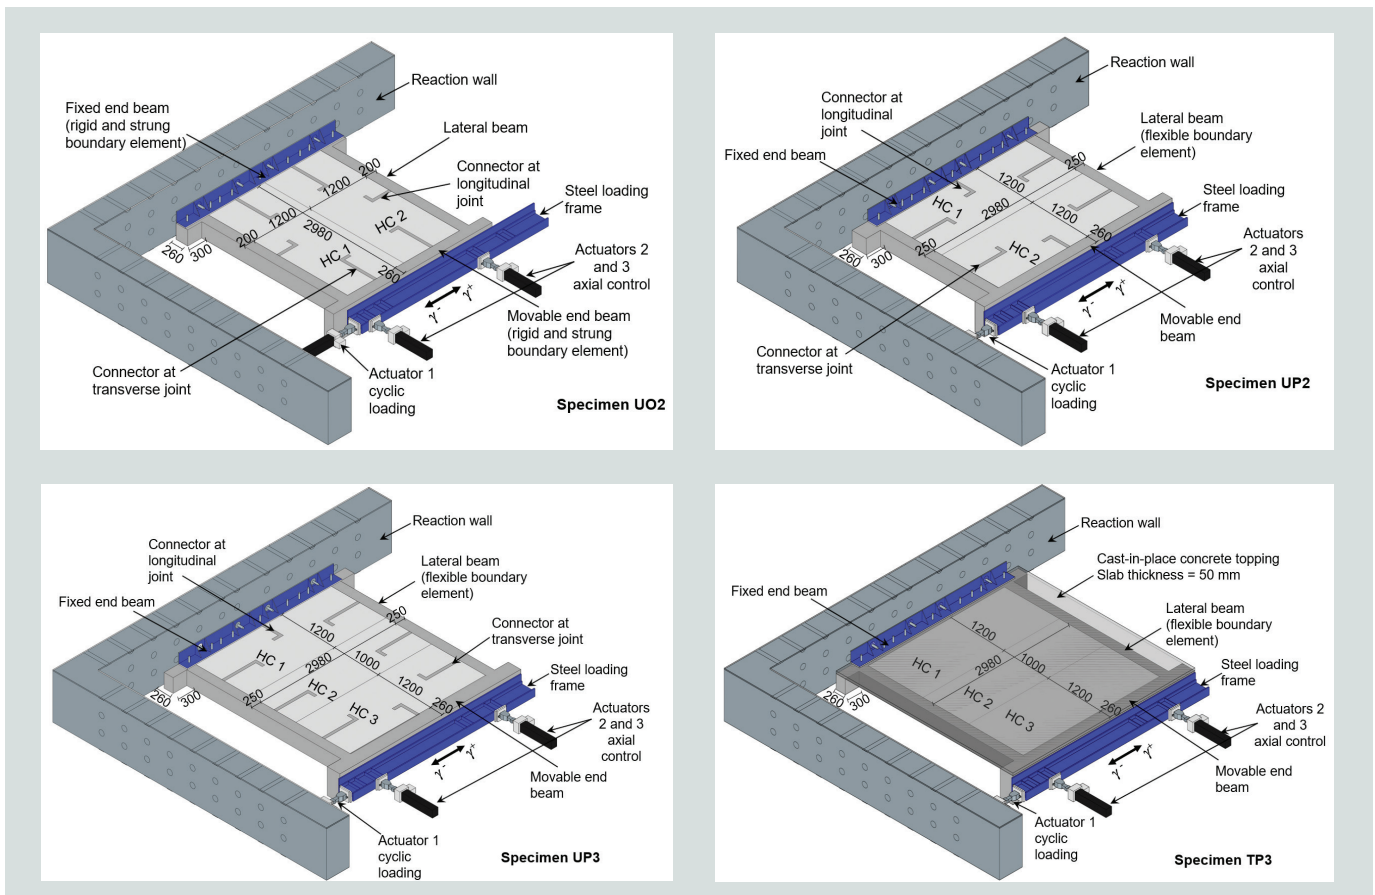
Test specimen and setup schematics. Note: All dimensions are in millimeters. 1 mm = 0.0394 in.
